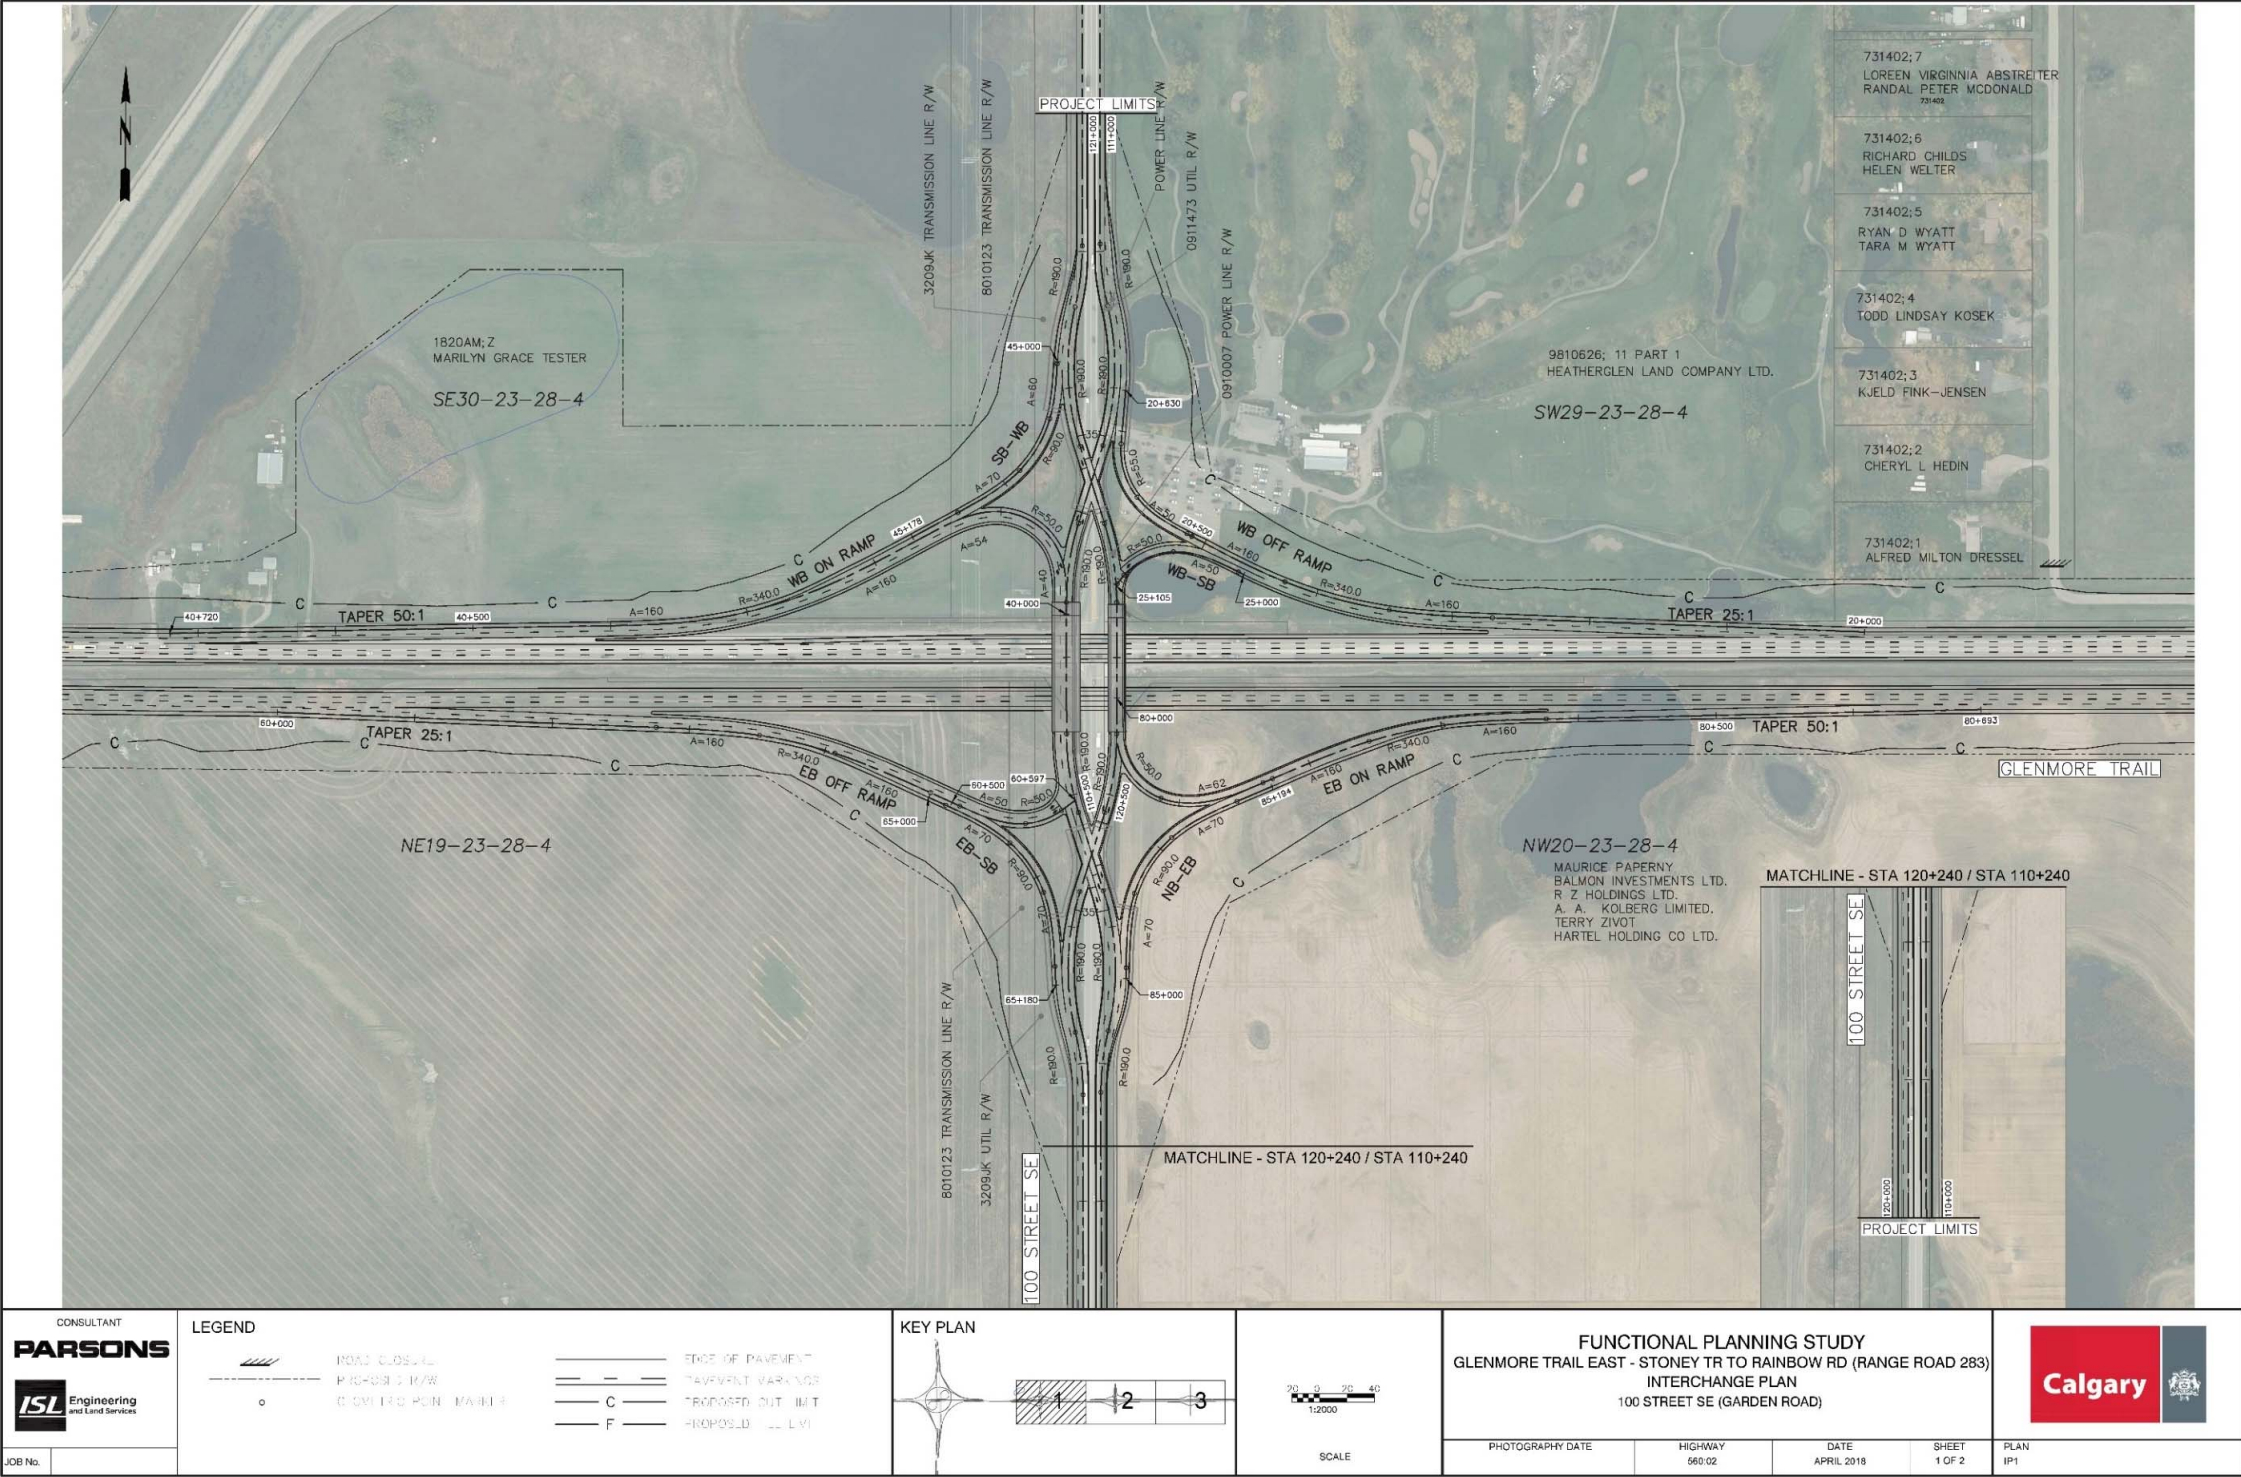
RECOMMENDED PLAN - 100 ST SE
